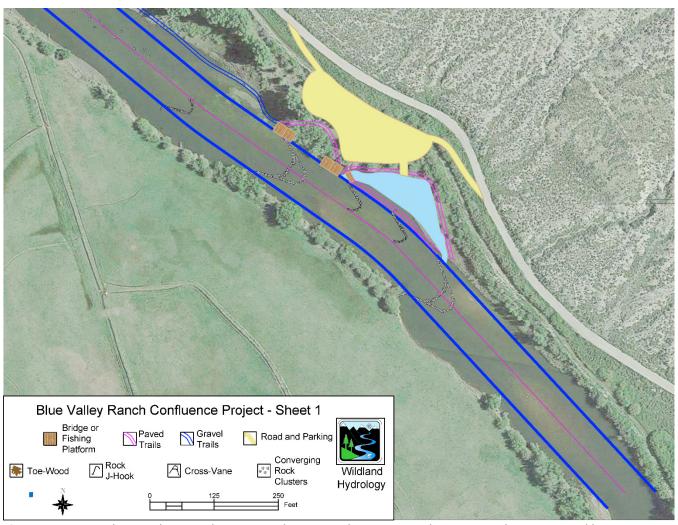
Design Sheet 1 showing the proposed structure locations, trail system, parking area, and boat ramp area.
